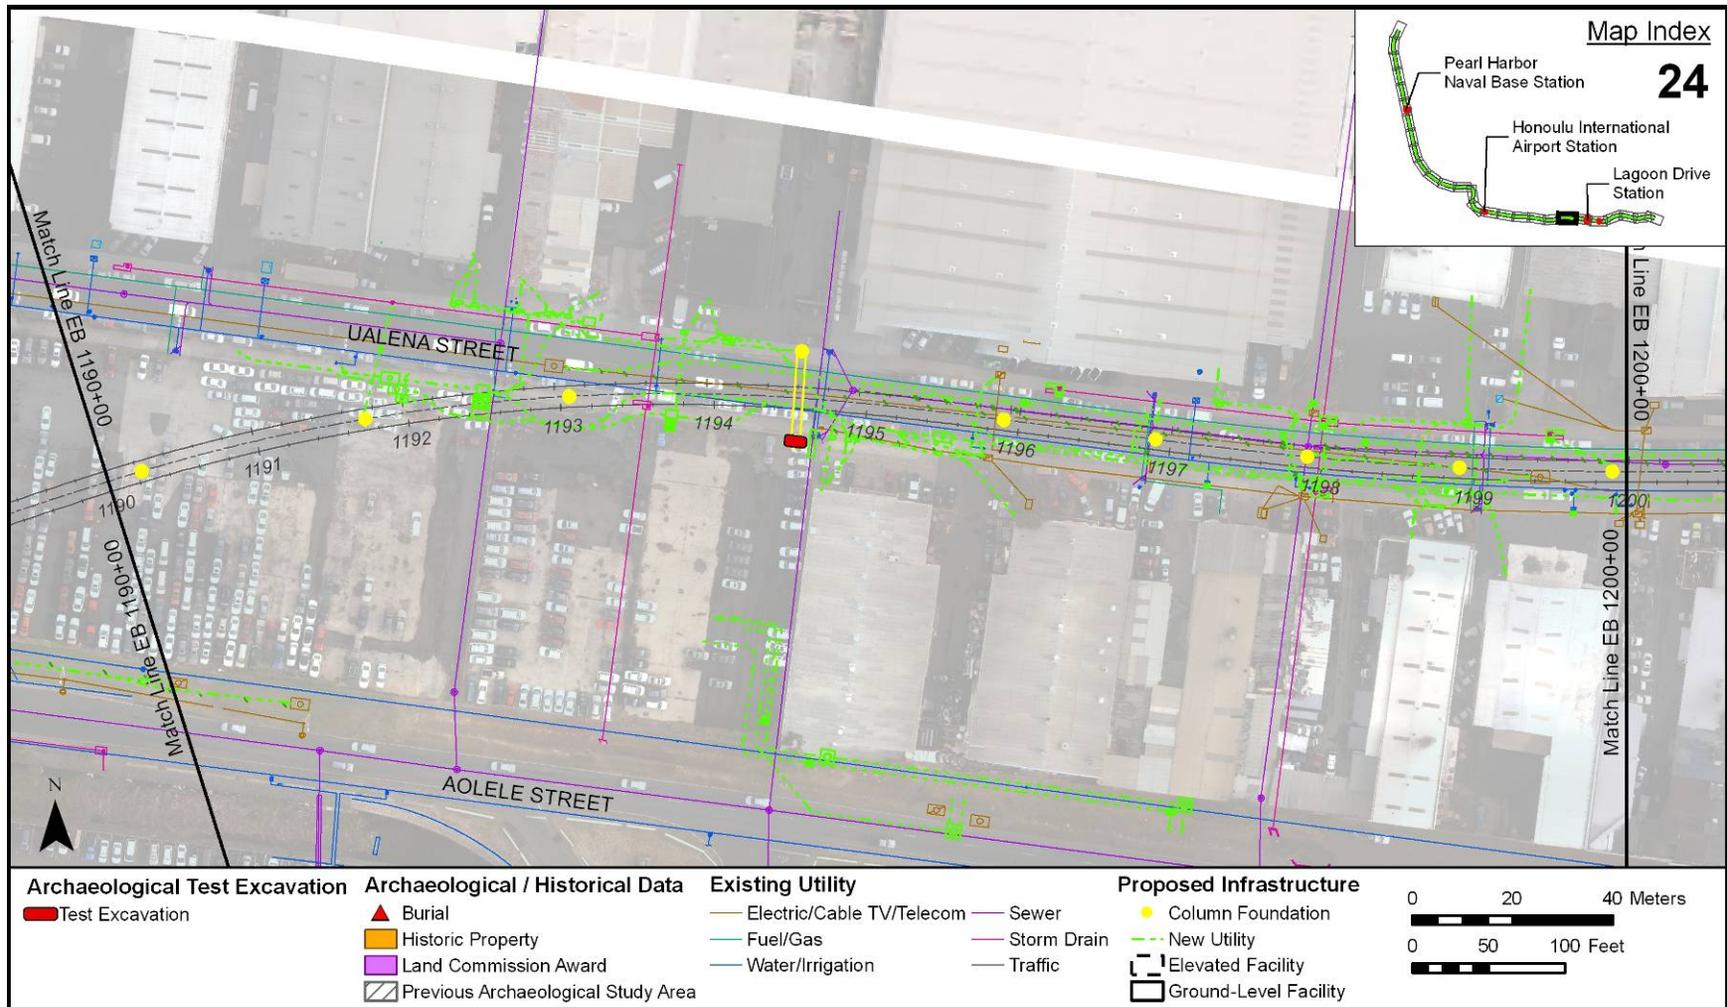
Map Sheet J 24, one 10x3 excavation at (makai) column foundation @ 1194+50
